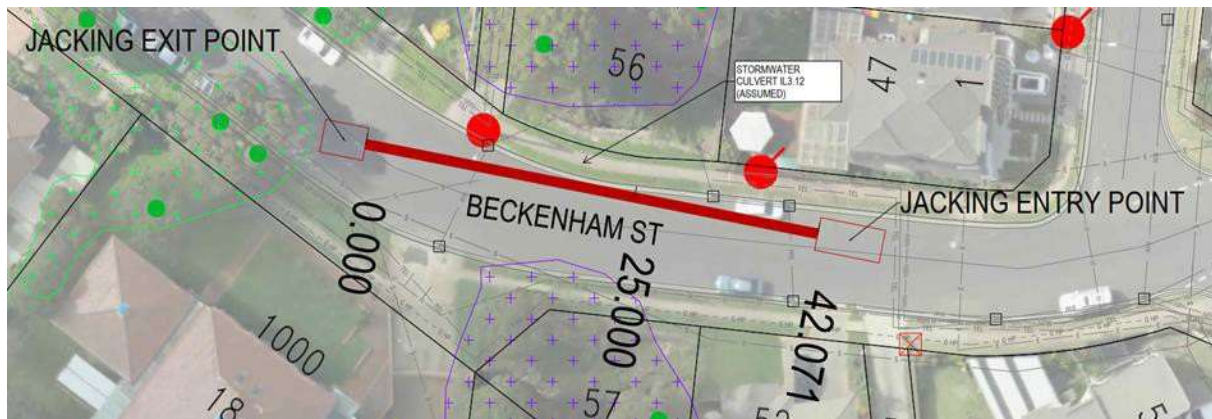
Beckenham Stormwater Crossing parking space removal area
